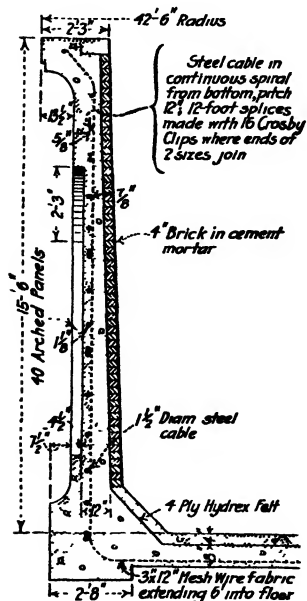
Cos Cob reinforced-concrete reservoir. Wall section.
